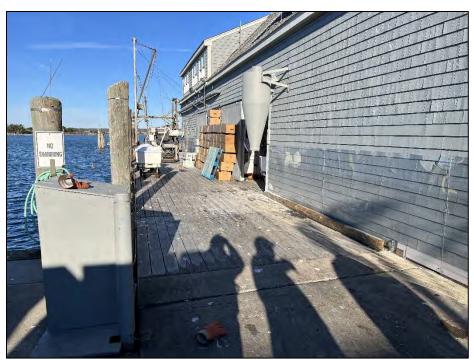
View of the top of deck and miscellaneous equipment on the adjacent pier to the building pier.
